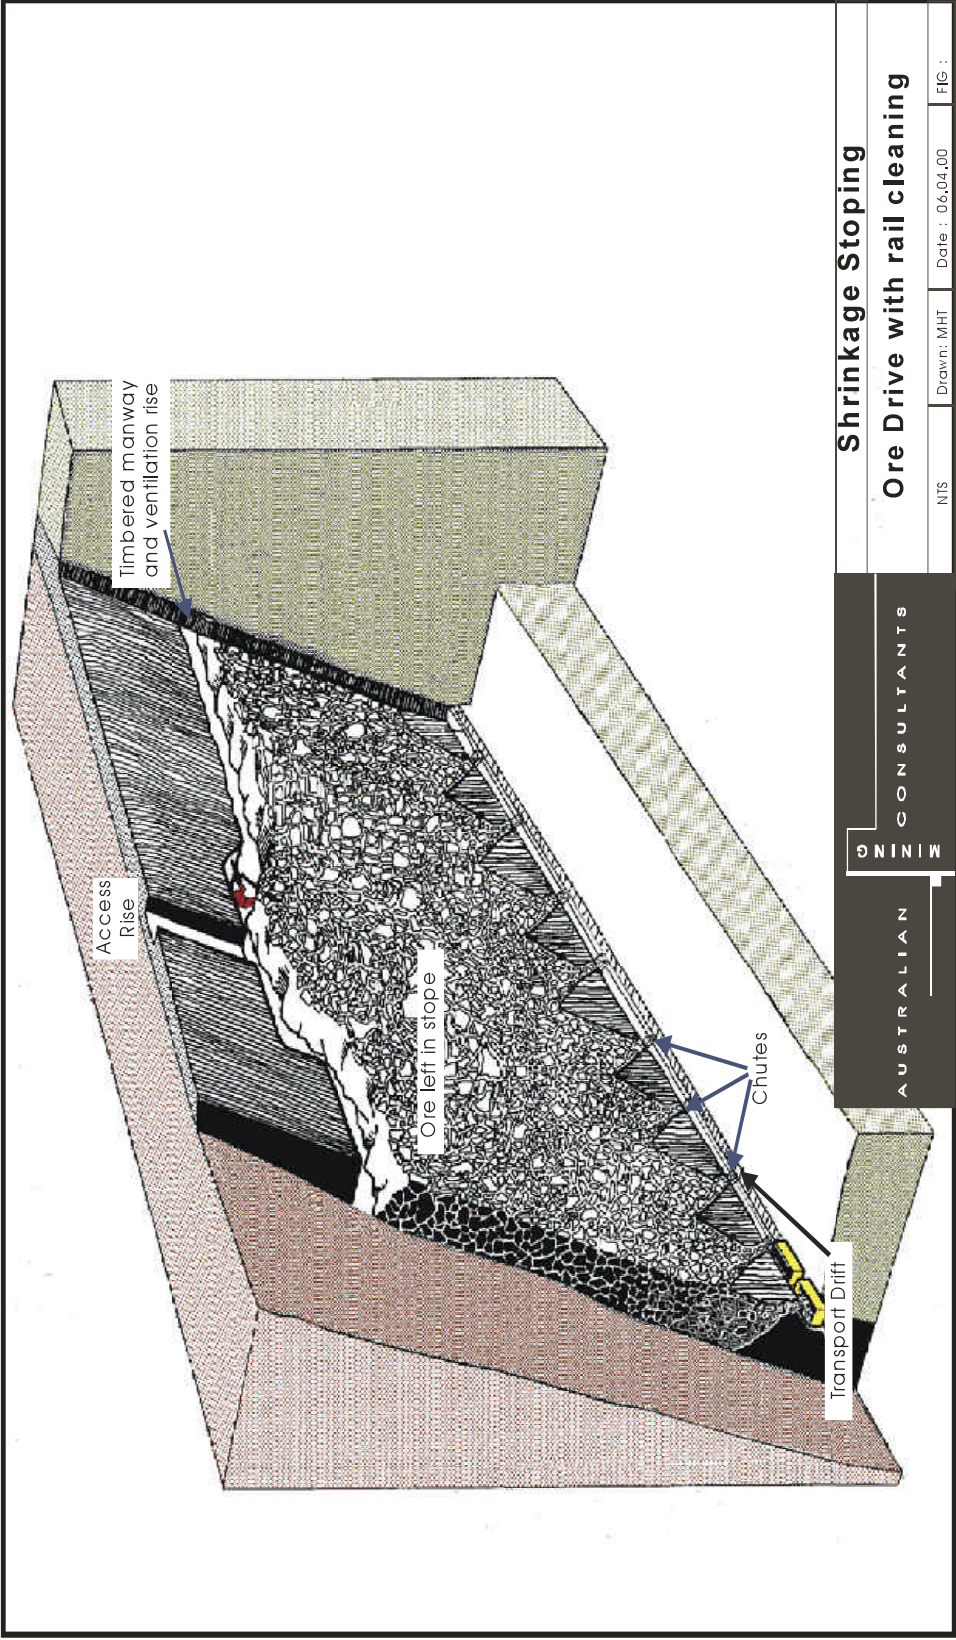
; Isometric view of Rail/Drawpoint Cross-cut Shrinkage Stopping
